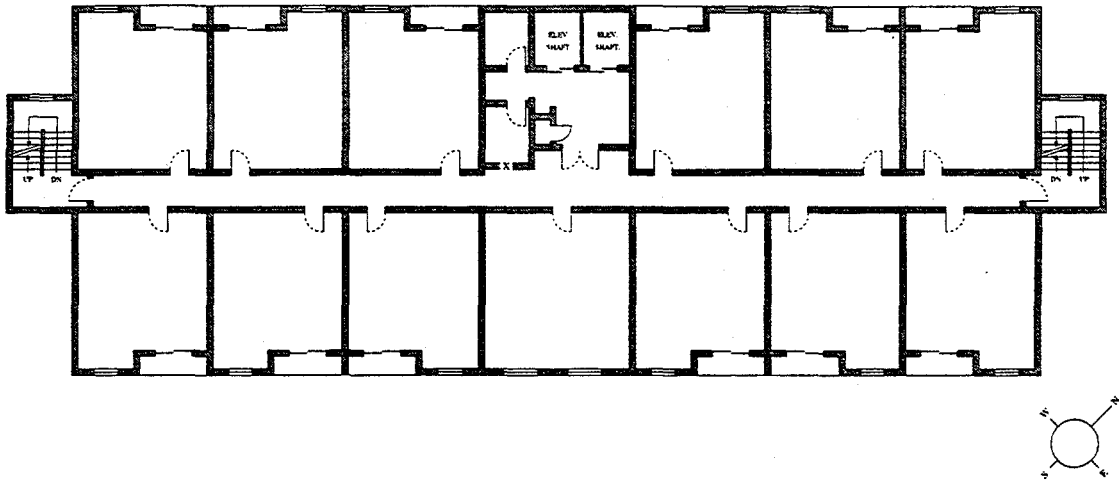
Typical floor plan (floors 6-12), Margolis Apartments, Chelsea, MA. The "x" shows the location of the supply ventilation register for each corridor.
